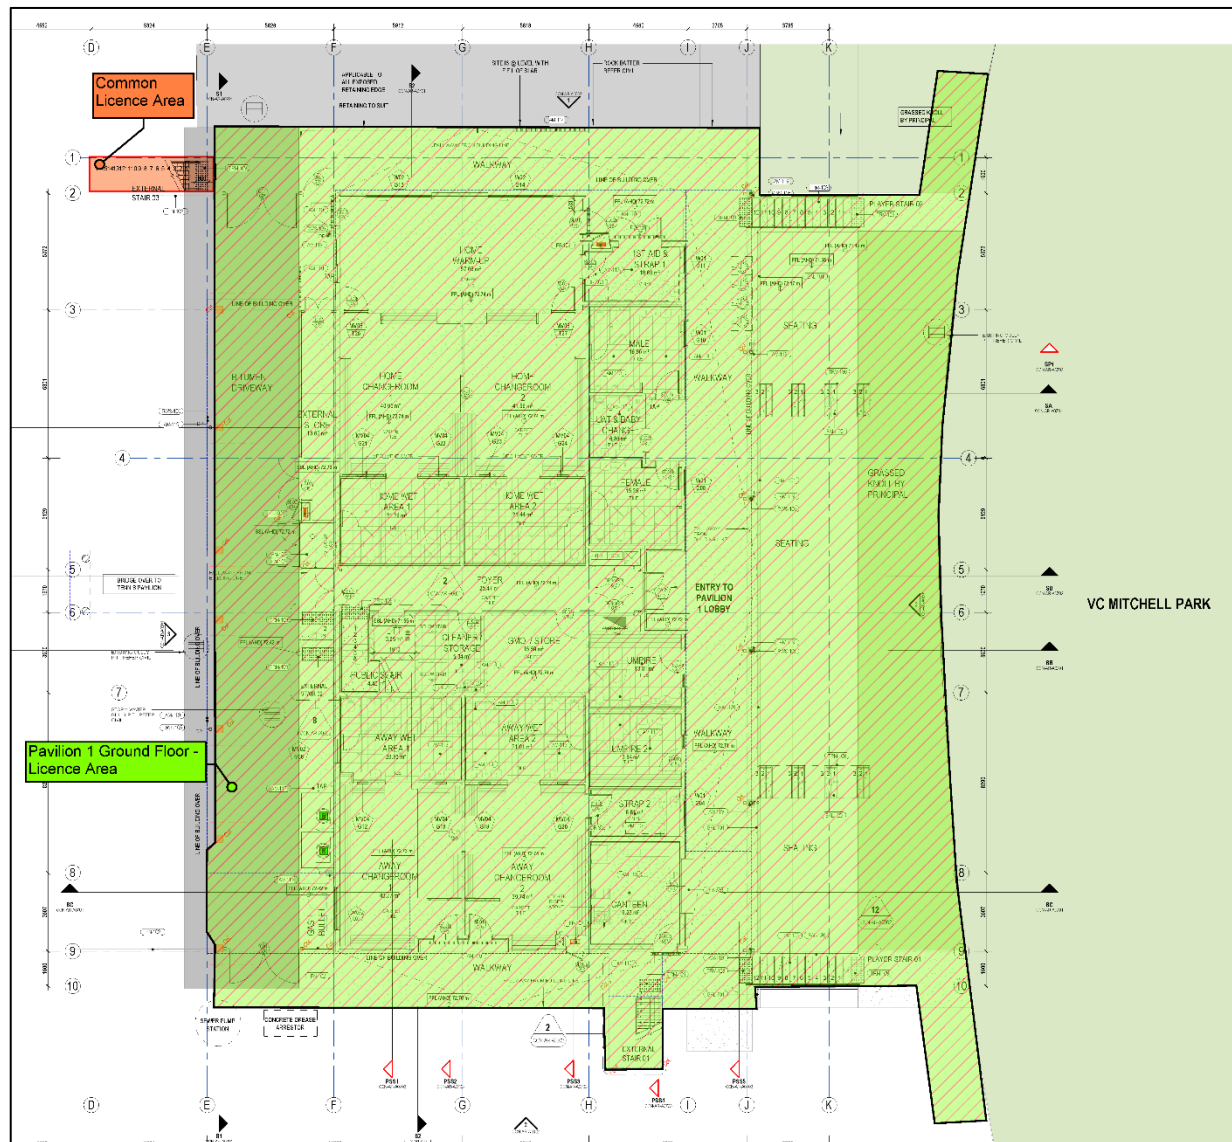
PAVILION 1, GROUND FLOOR – PROPOSED LICENCED AREA
